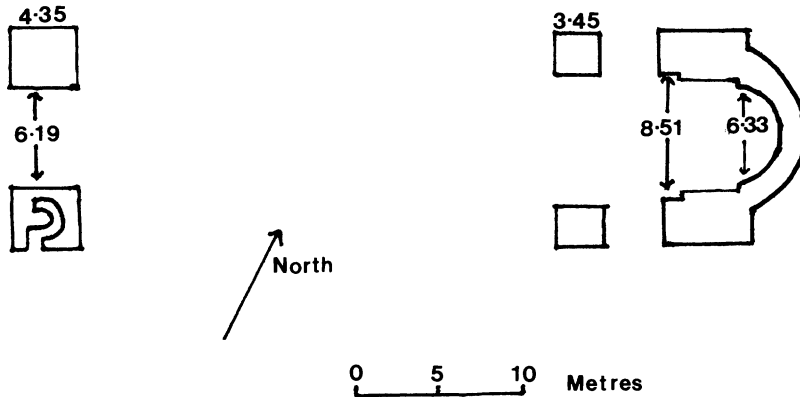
Ground plans of triumphal arch and apse (after Texier).
